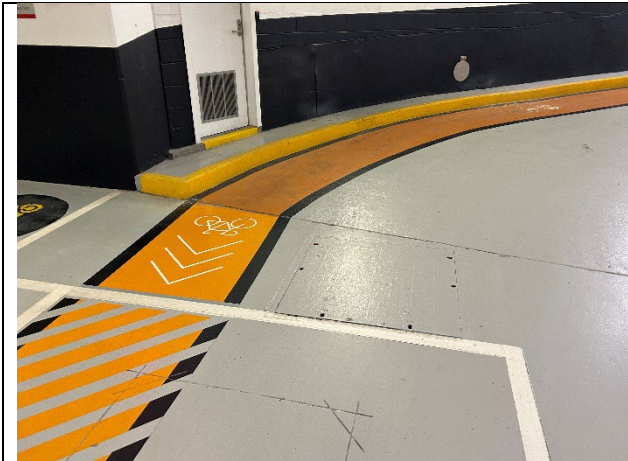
Level B2, carpark, adjacent ramp, unknown pit.
